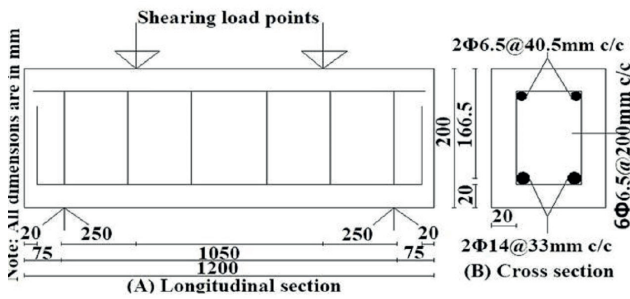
Longitudinal-cross sections of the UHPC beam with stirrups
